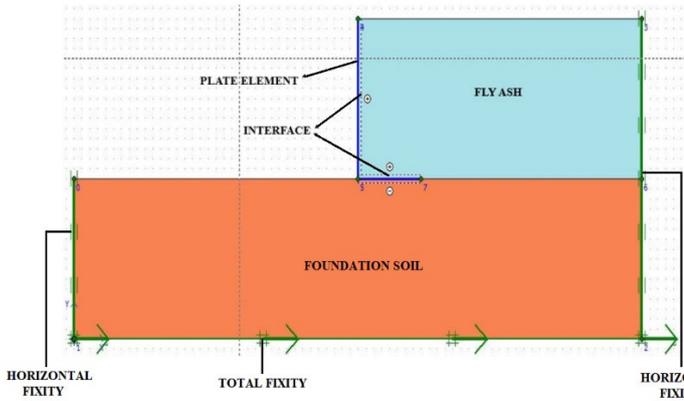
Case I- Geometry and boundary conditions of retaining wall model without EPS.
